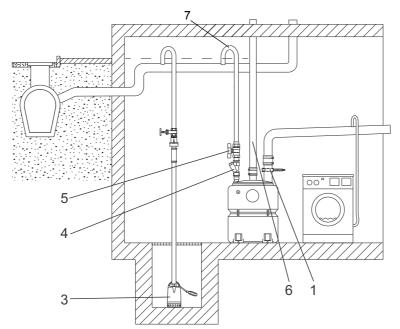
Installation example with a tank on the basement floor. The diaphragm pump is not shown
